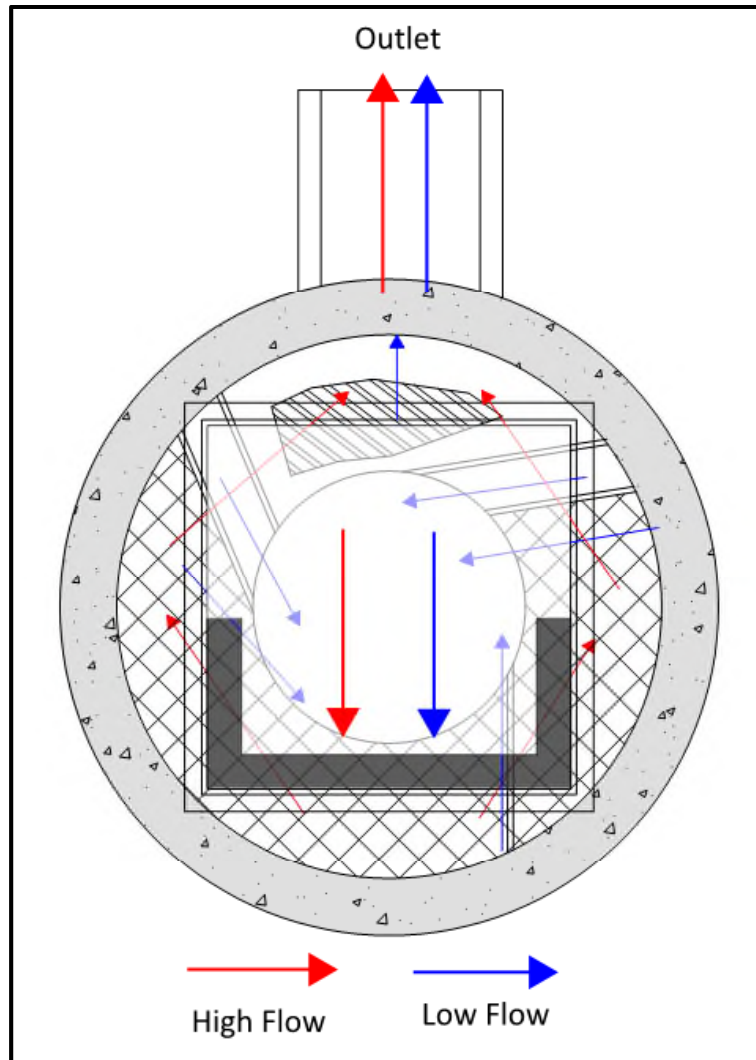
Hydroworks HydroStorm Operation – Plan View
